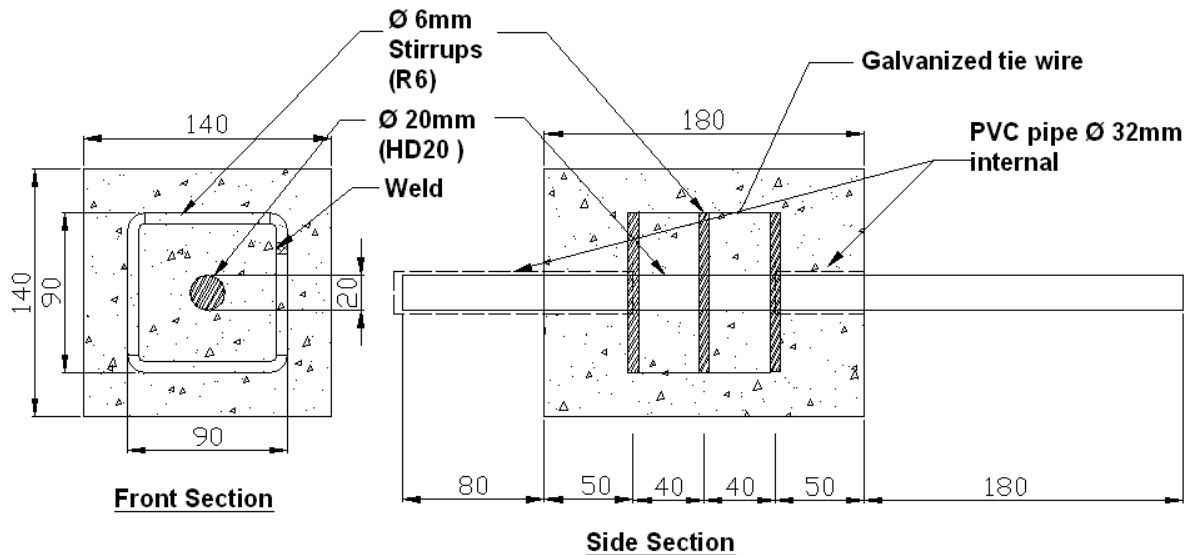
Test specimen (using 6mm stirrups), Left: Cross-section front, Right: Cross-section side.
